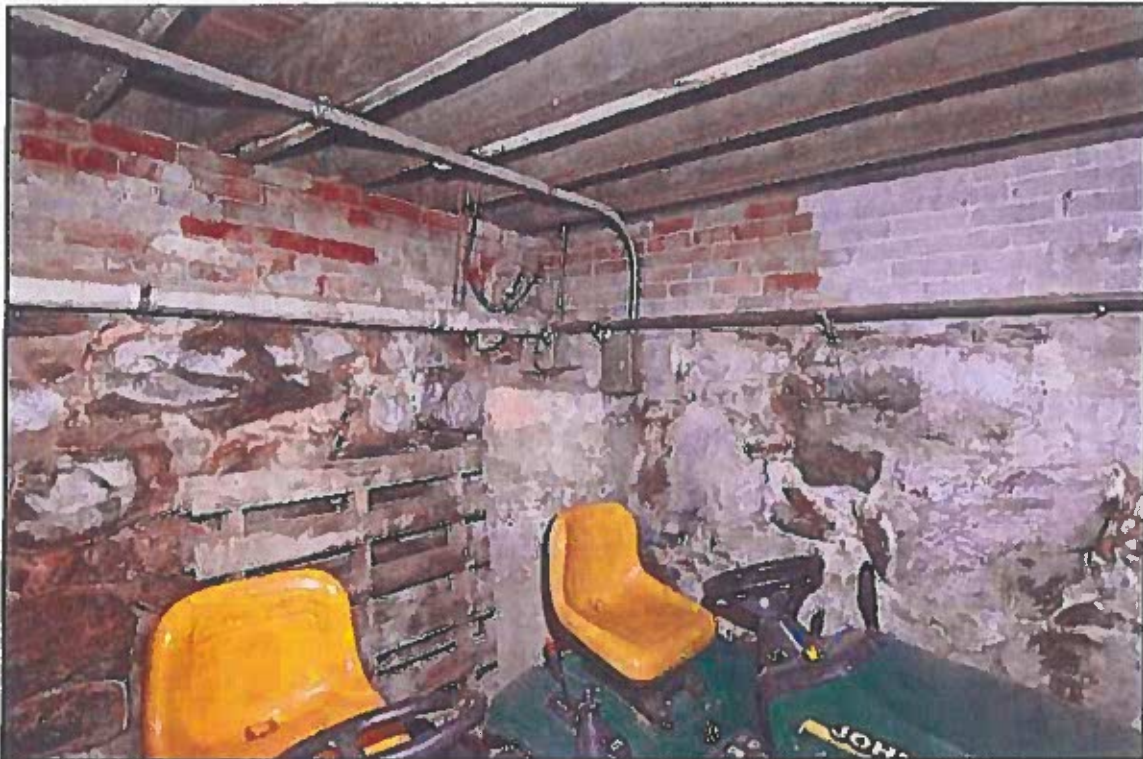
Interior of basement at southwest corner showing fieldstone laid in mortar below grade with brick from about 6" below grade up to the underside of the wood sills. As viewed from this side the sills generally appeared intact without visible damage.
